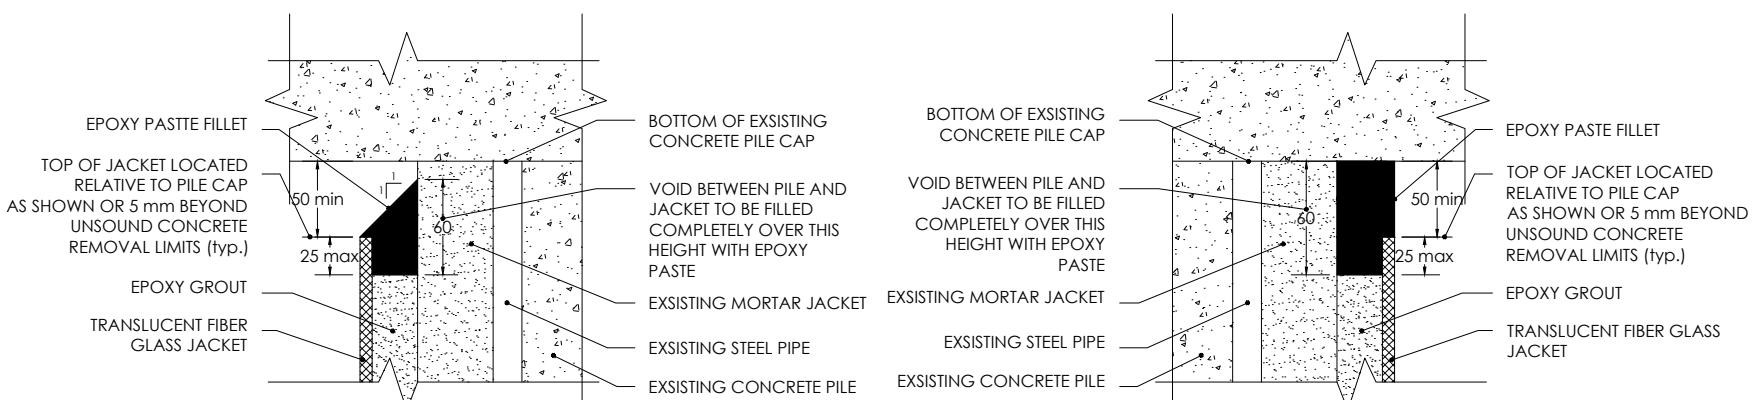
DETAIL - JACKET TOP SEAL CONNECTION (A1)
